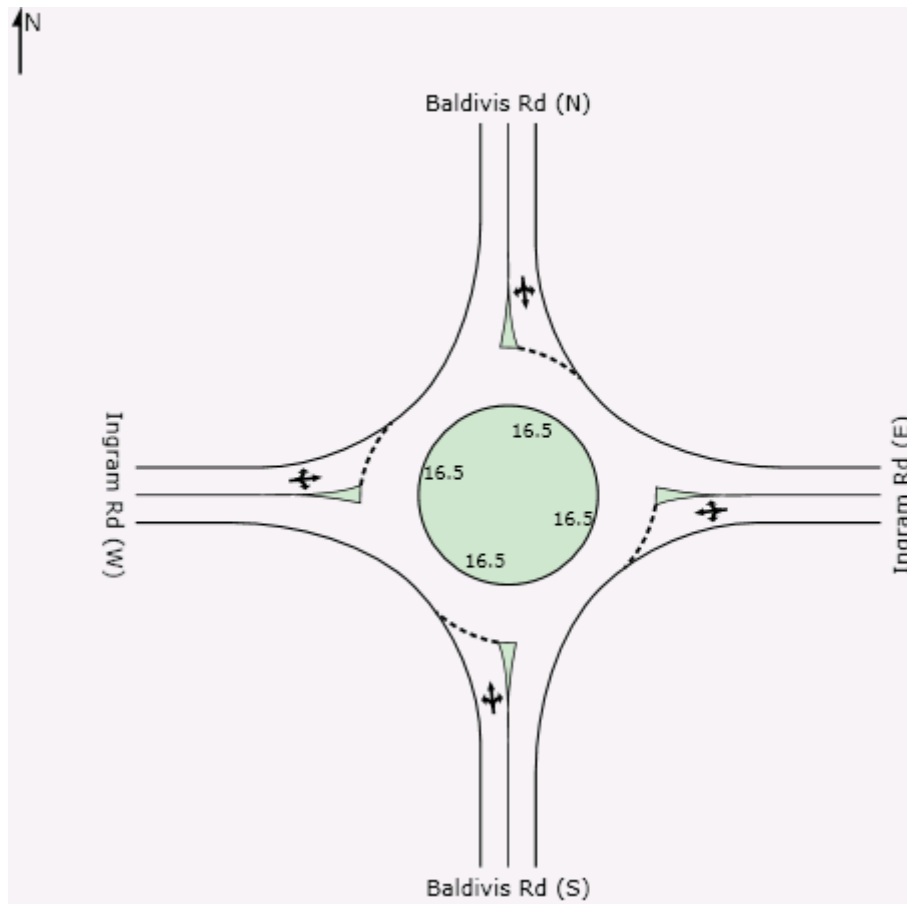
Baldivis Road / Ingram Road roundabout proposed layout
